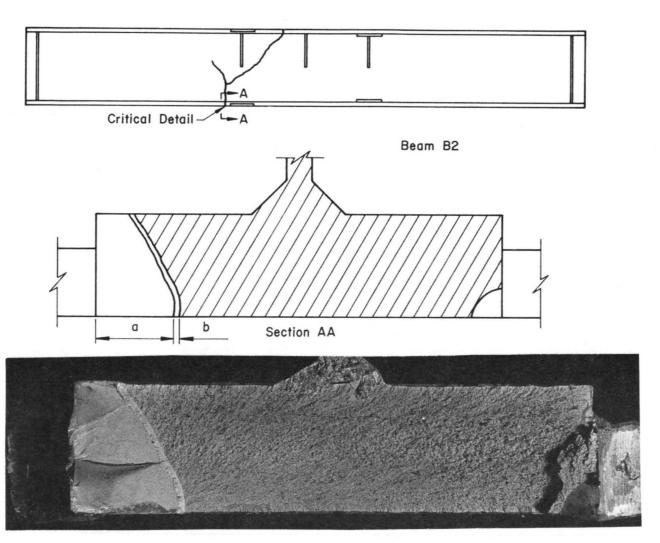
Fatigue and Fracture Surface, B2 (A514)
